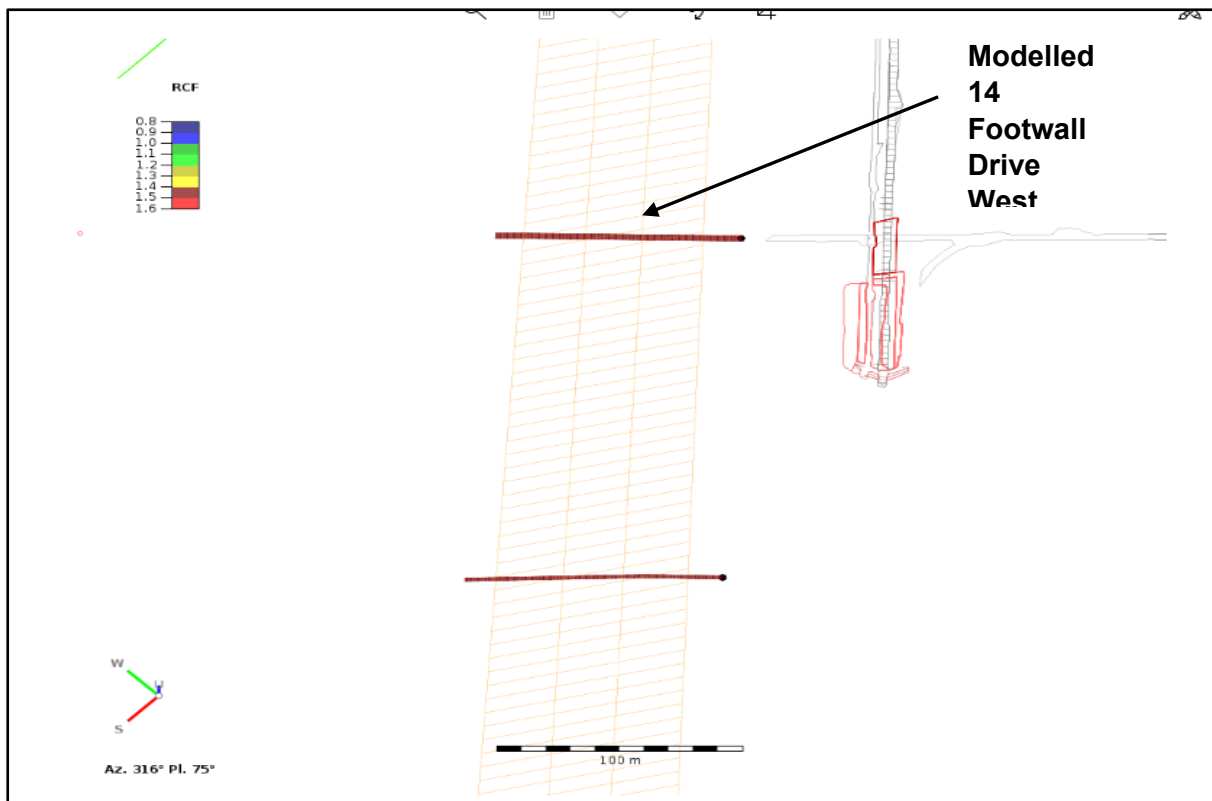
Plan showing 14-footwall drive west haulage traversing Big John Dyke
